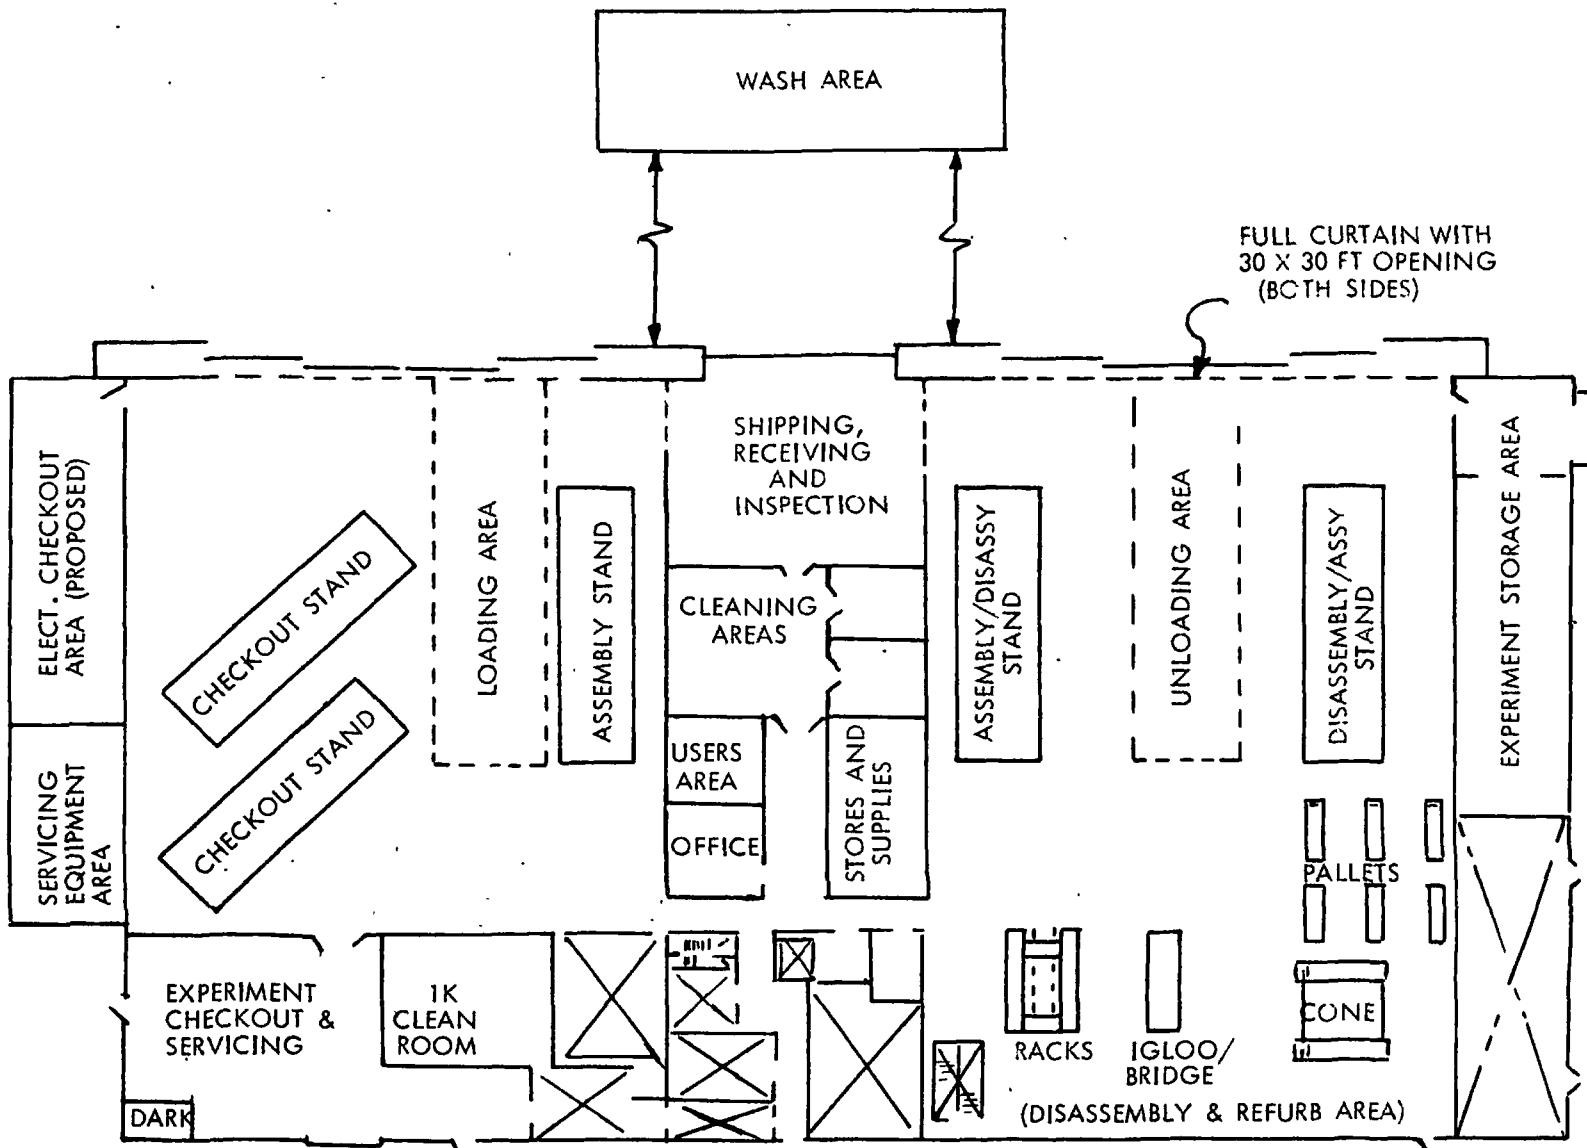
Spacelab Processing Facility (MSFC)
